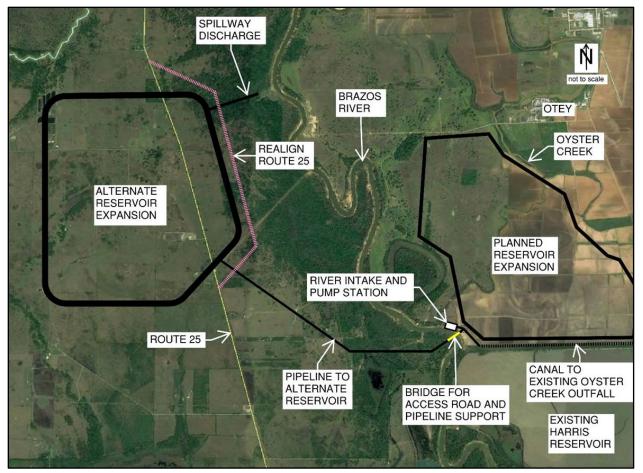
Conceptual layout of West Bank alternative reservoir.
